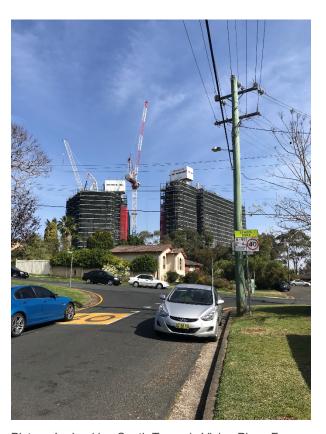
Looking South Towards Vivien Place From Gilham Street
